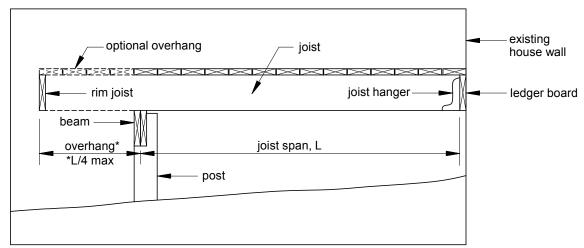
JOIST SPAN - DECK ATTACHED AT HOUSE
